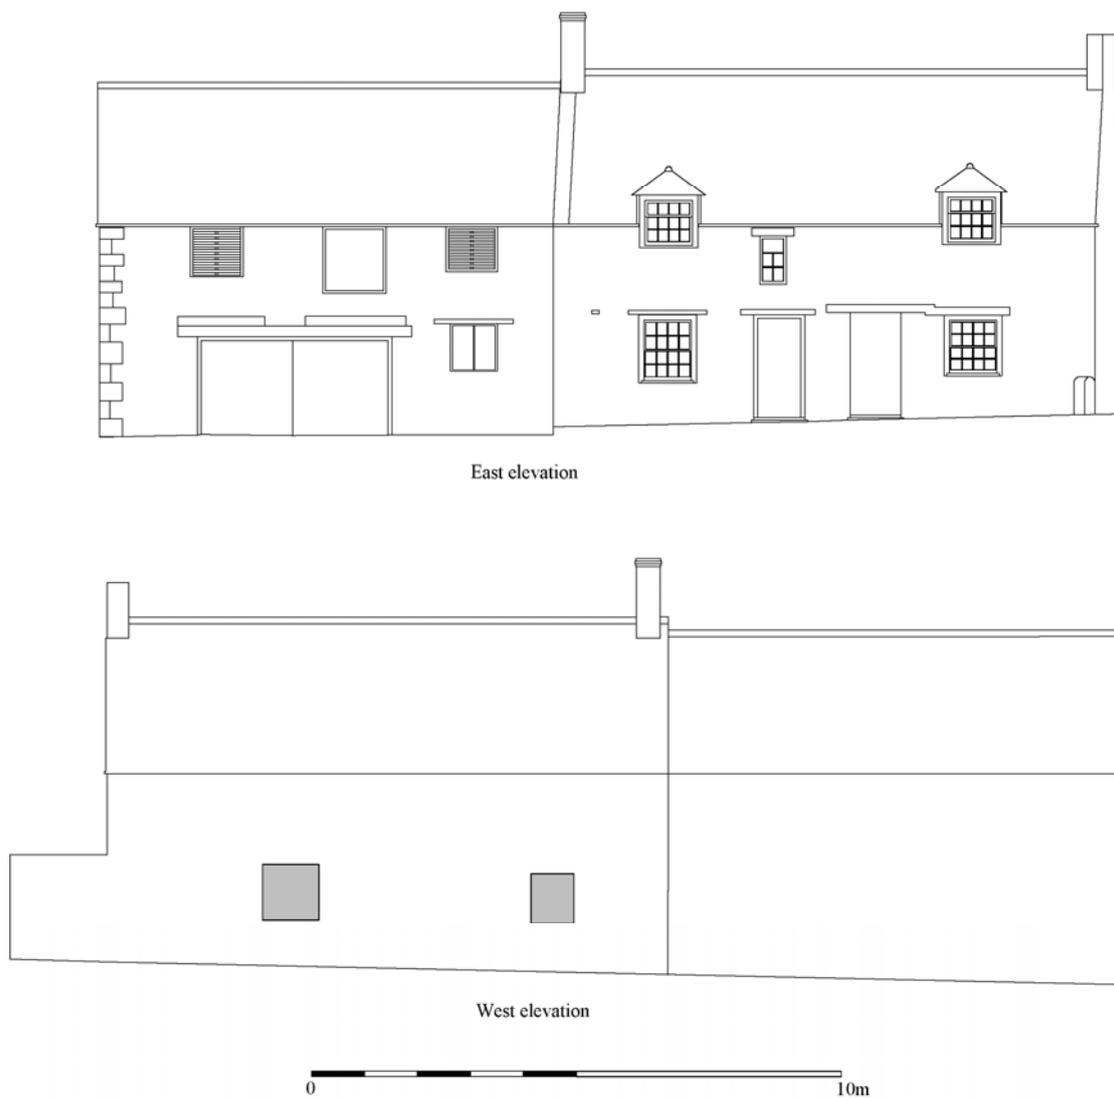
East and west elevations of 1 and 2 Setchells Yard
